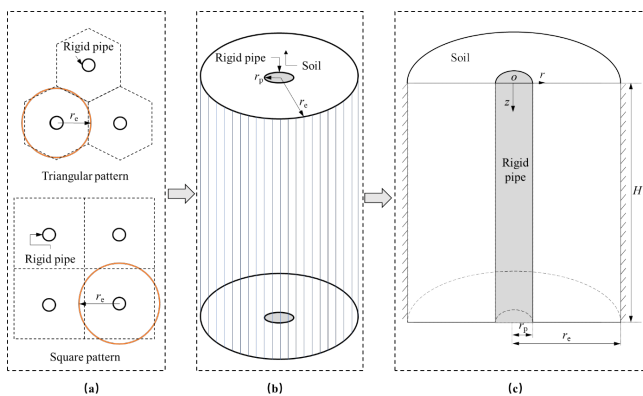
Diagram of pile-soil foundation: (a) pile layout; (b) pile-soil element; and (c) mathematical model of pile-soil element.
